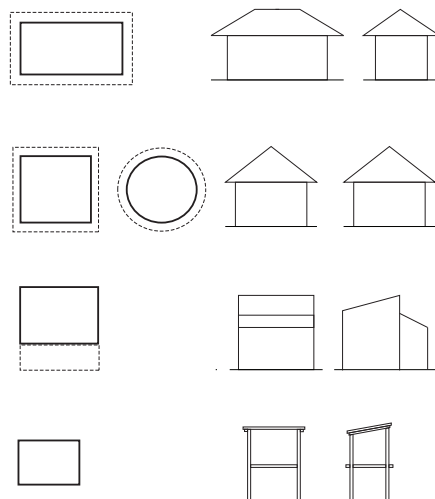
Drawing of building types: Rectangular and round private homes, shops and market stalls
